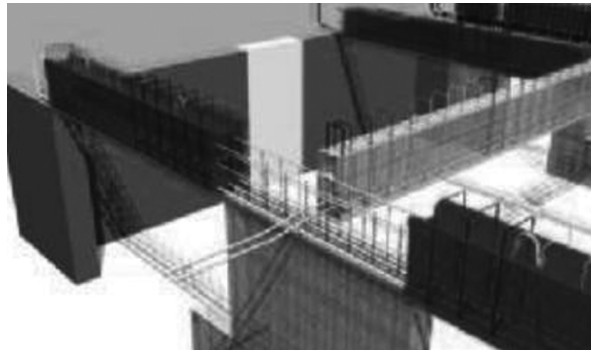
Collision detection of prefabricated wall, beam and reinforcement
